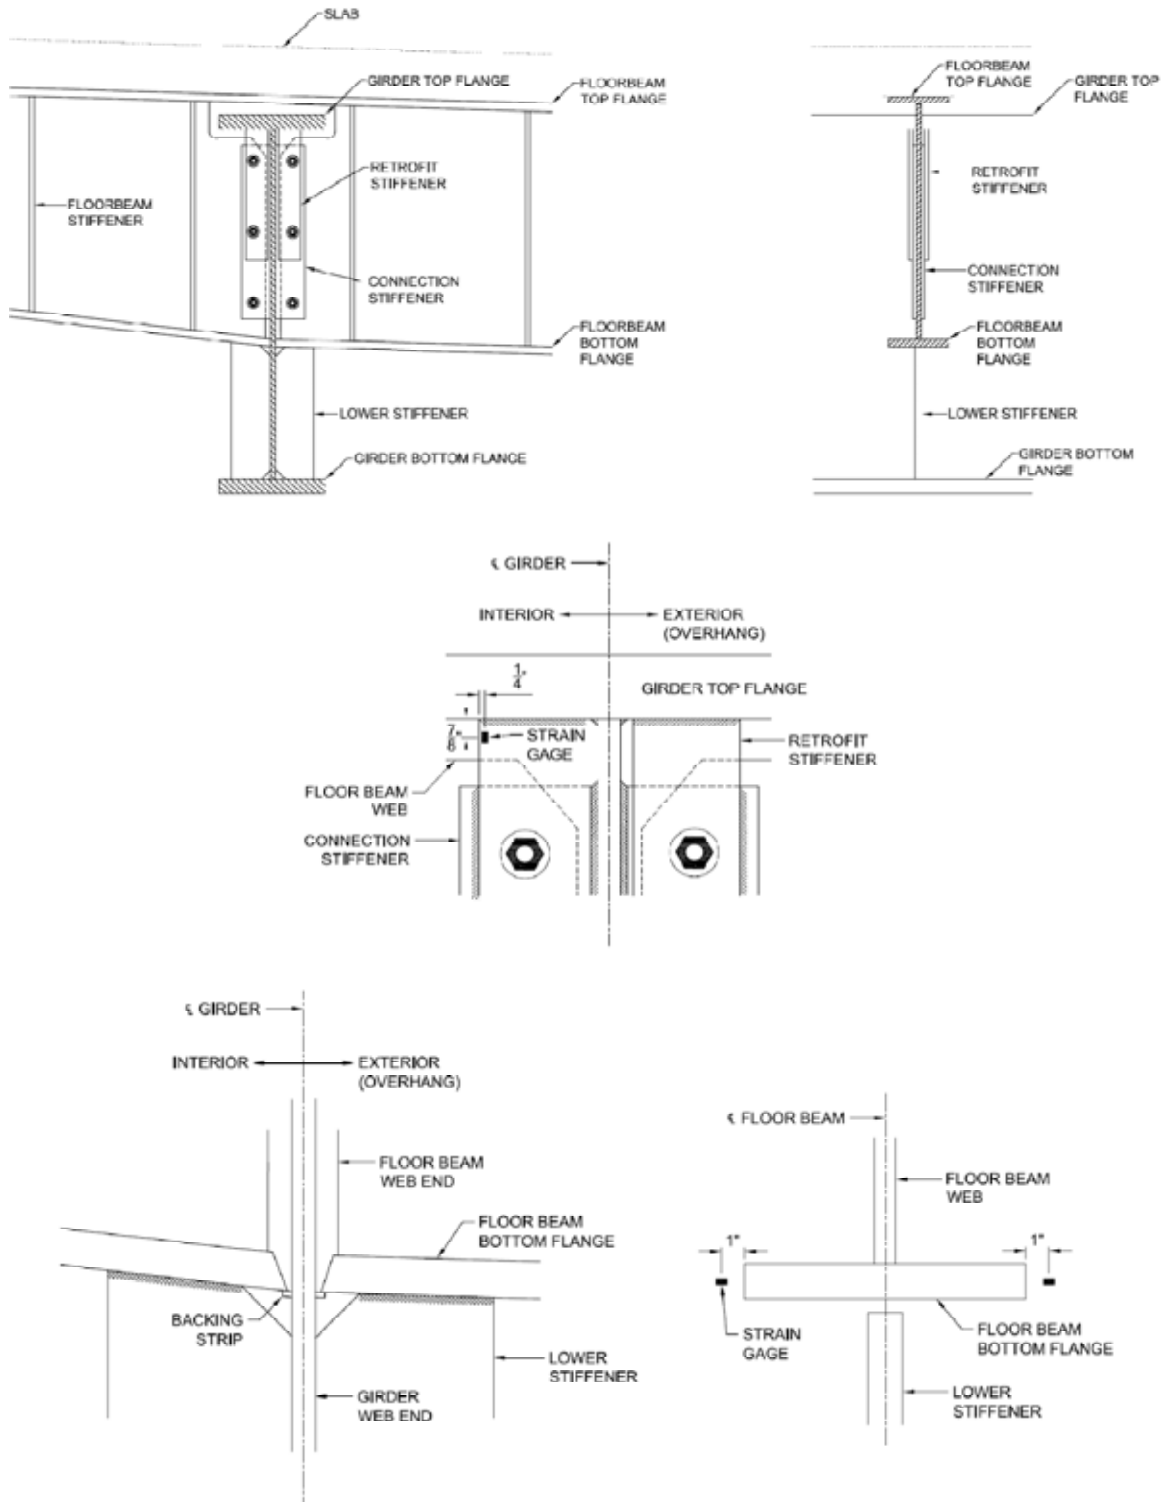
Section F17S Floor Beam 18 - Girder 2 Connection Detail and Strain Gage Locations
